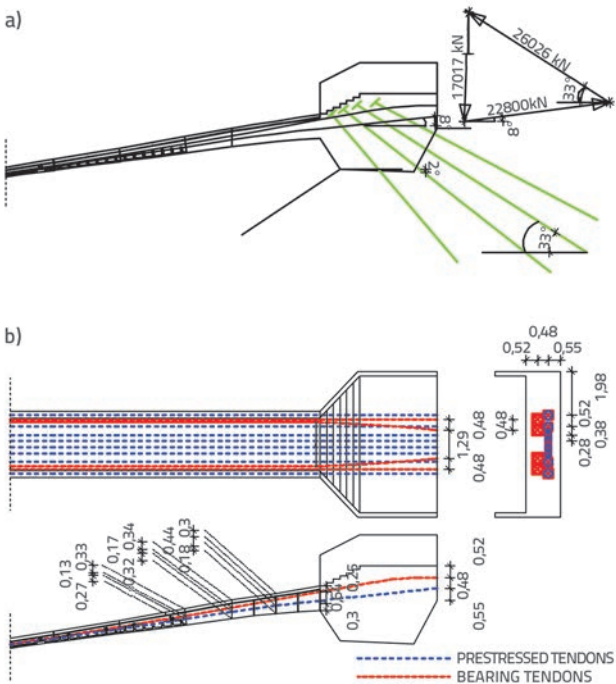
Some bridge solutions at abutments: a) resulting forces in tendons and ground anchors; b) tendon guiding details
